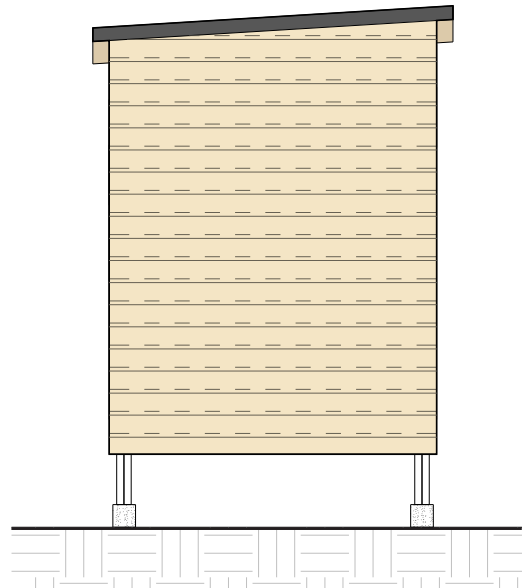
ELEVATION D-D OF THE BUILT CABIN.
